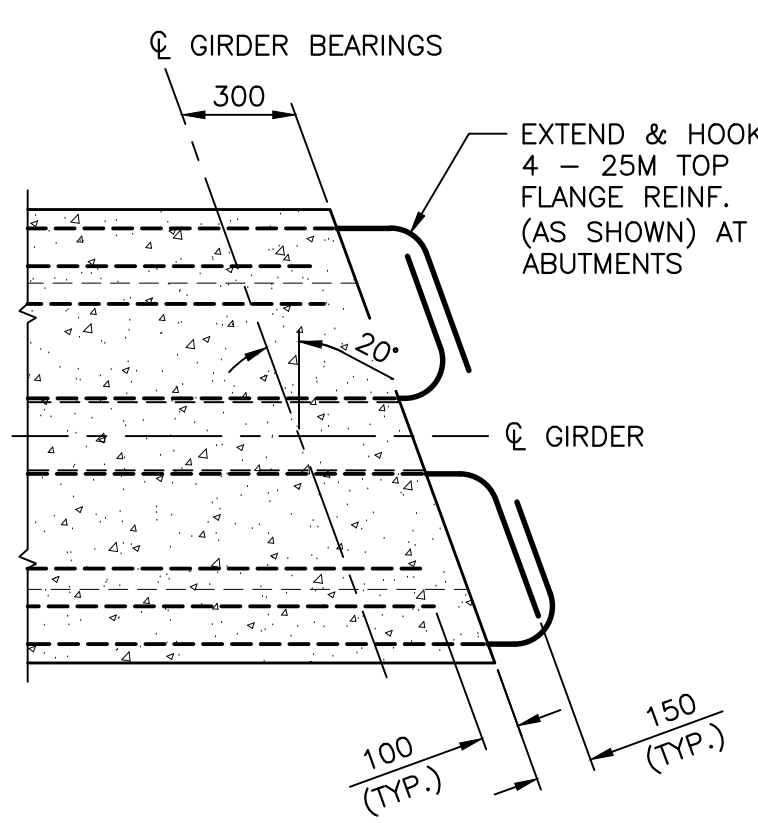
DETAIL - TYPICAL GIRDER DIMENSIONS (1) S7
